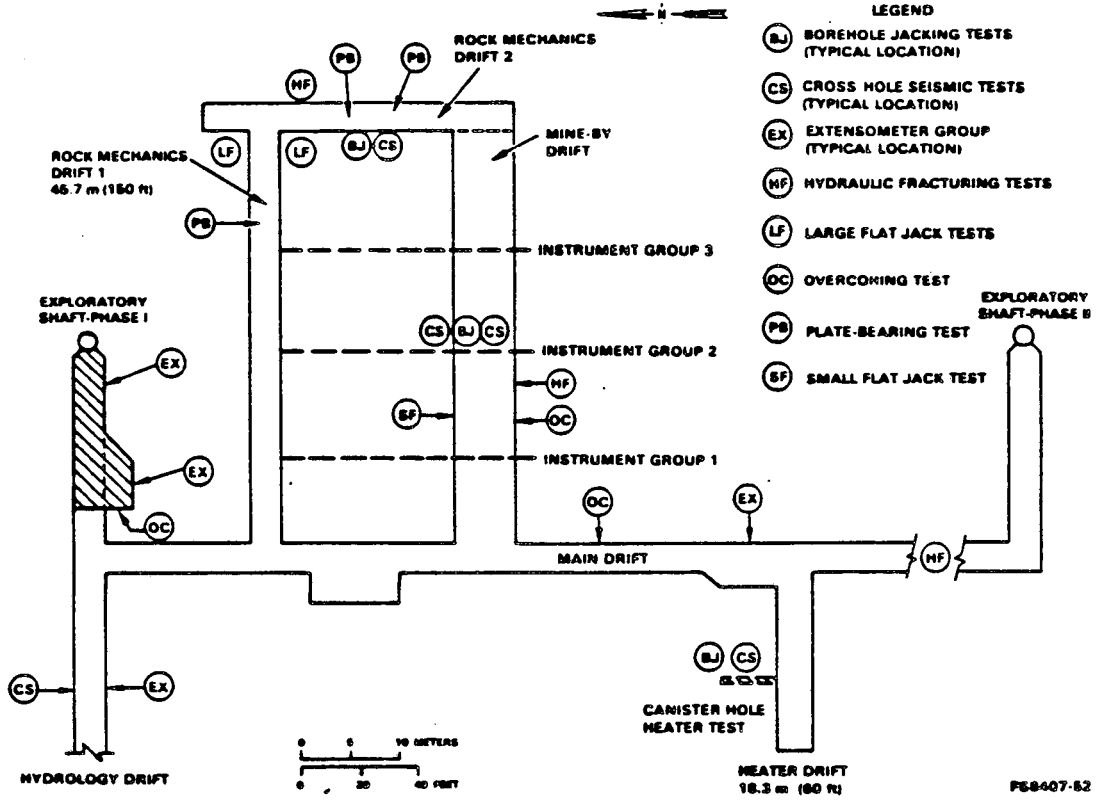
Plan View of ES-11 Facility Showing Rock Mechanics Test Location.
